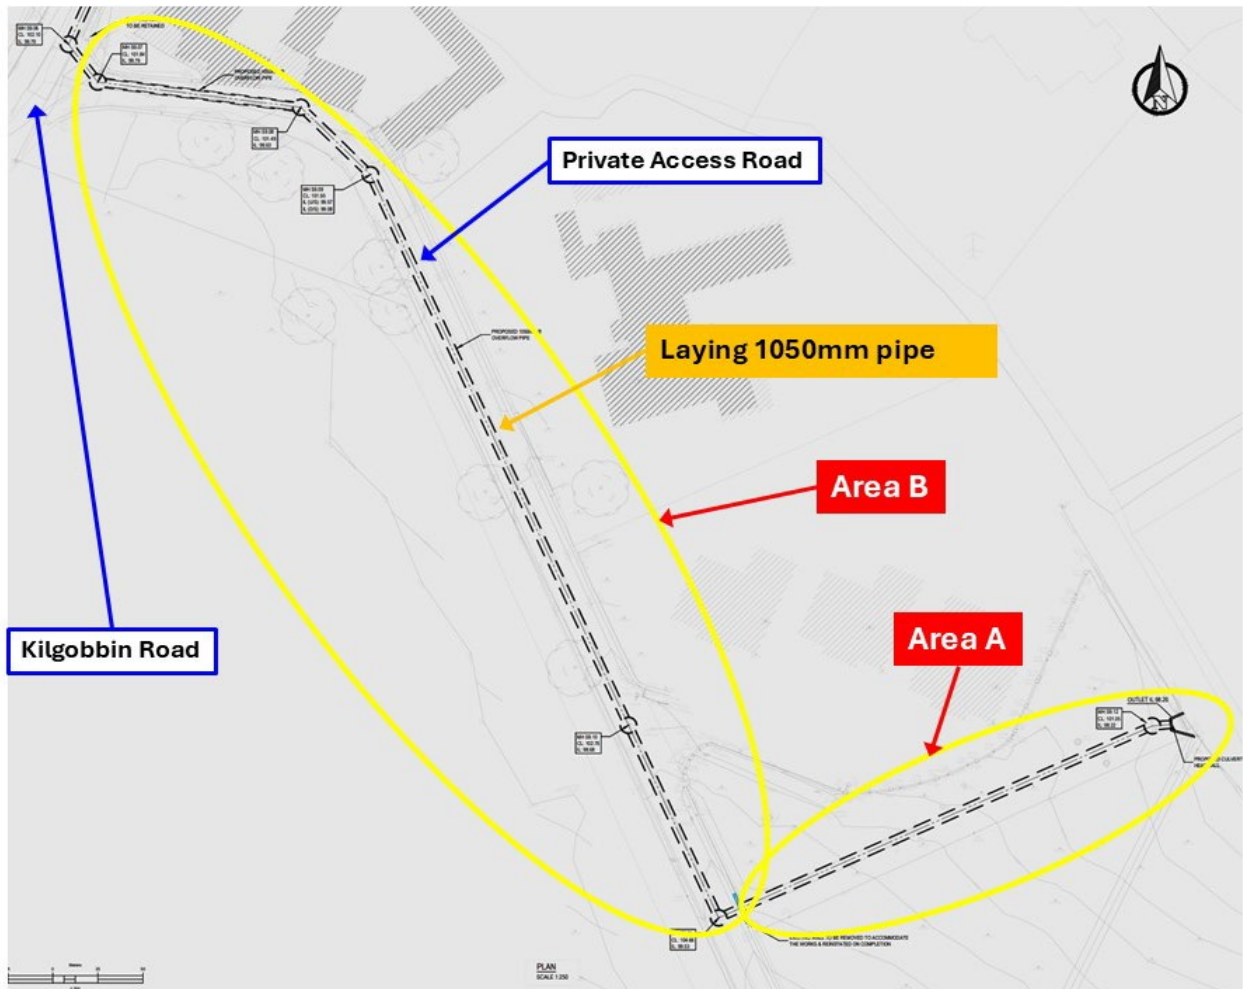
Section of Proposed Works at Kilgobbin Site (Part 1 of 2)
